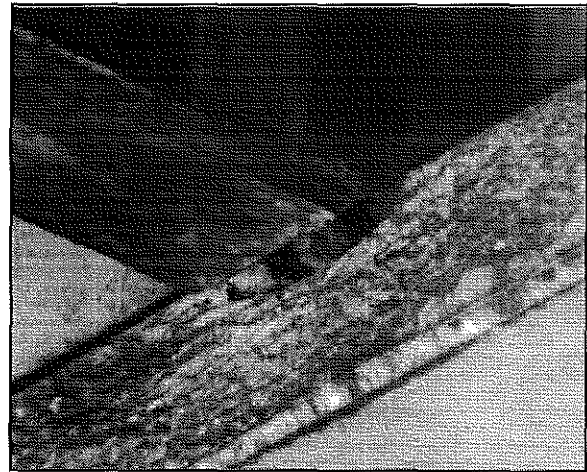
Concrete Spalling at Diaphragm-Girder Interface.
